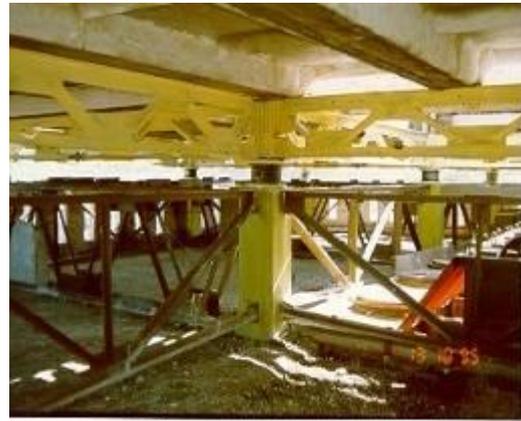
The building construction with the method of additional “upper flexible storey” and seismic isolation by means of laminated rubber
